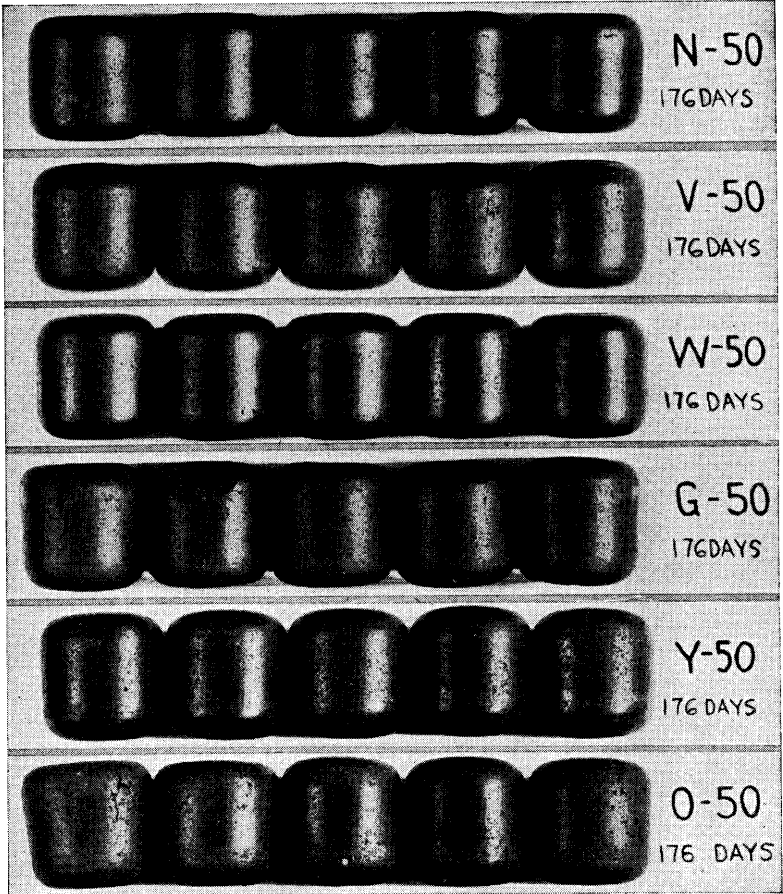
SHEET ASPHALT SPECIMENS AFTER
